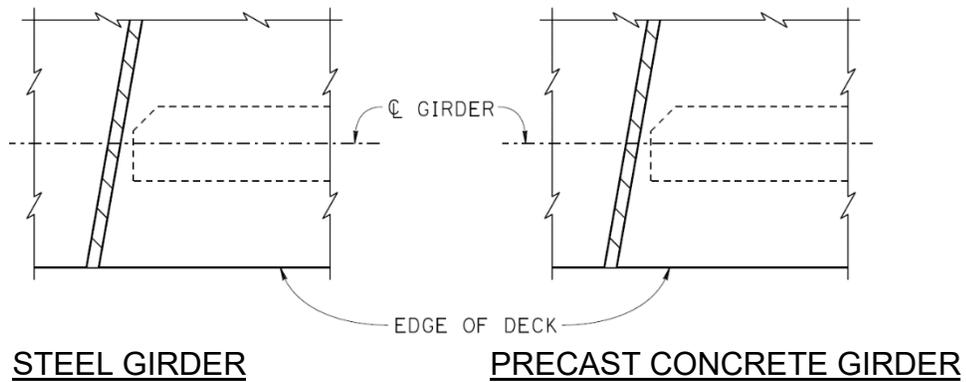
Deck Joints at Girders (Skew 0° to 20°)
